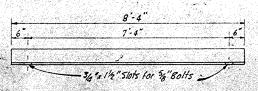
DETAIL OF SHEAR PLATE CONSTRUCTION JOINT
